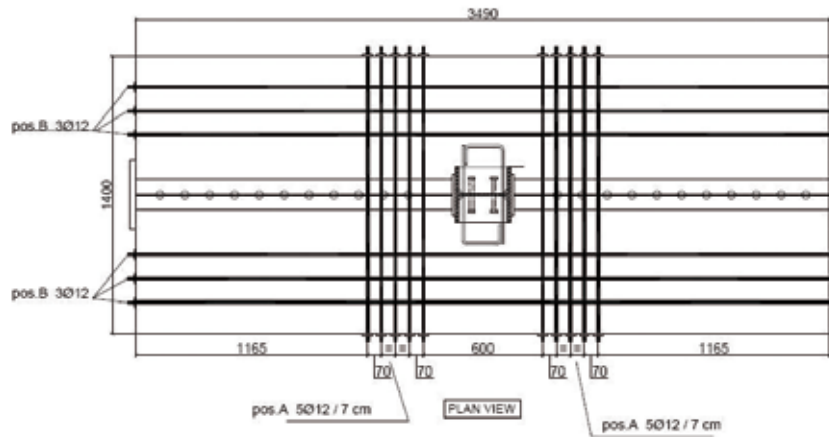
Plan view of the internal Type 1 specimen showing the reinforcement layout
